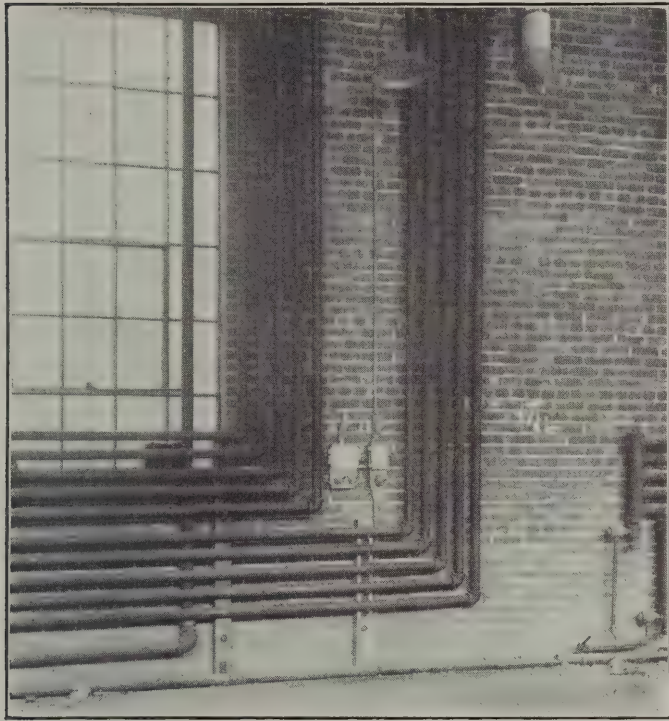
Typical Location of Switches and Runway Light on Outer Circle Wall
